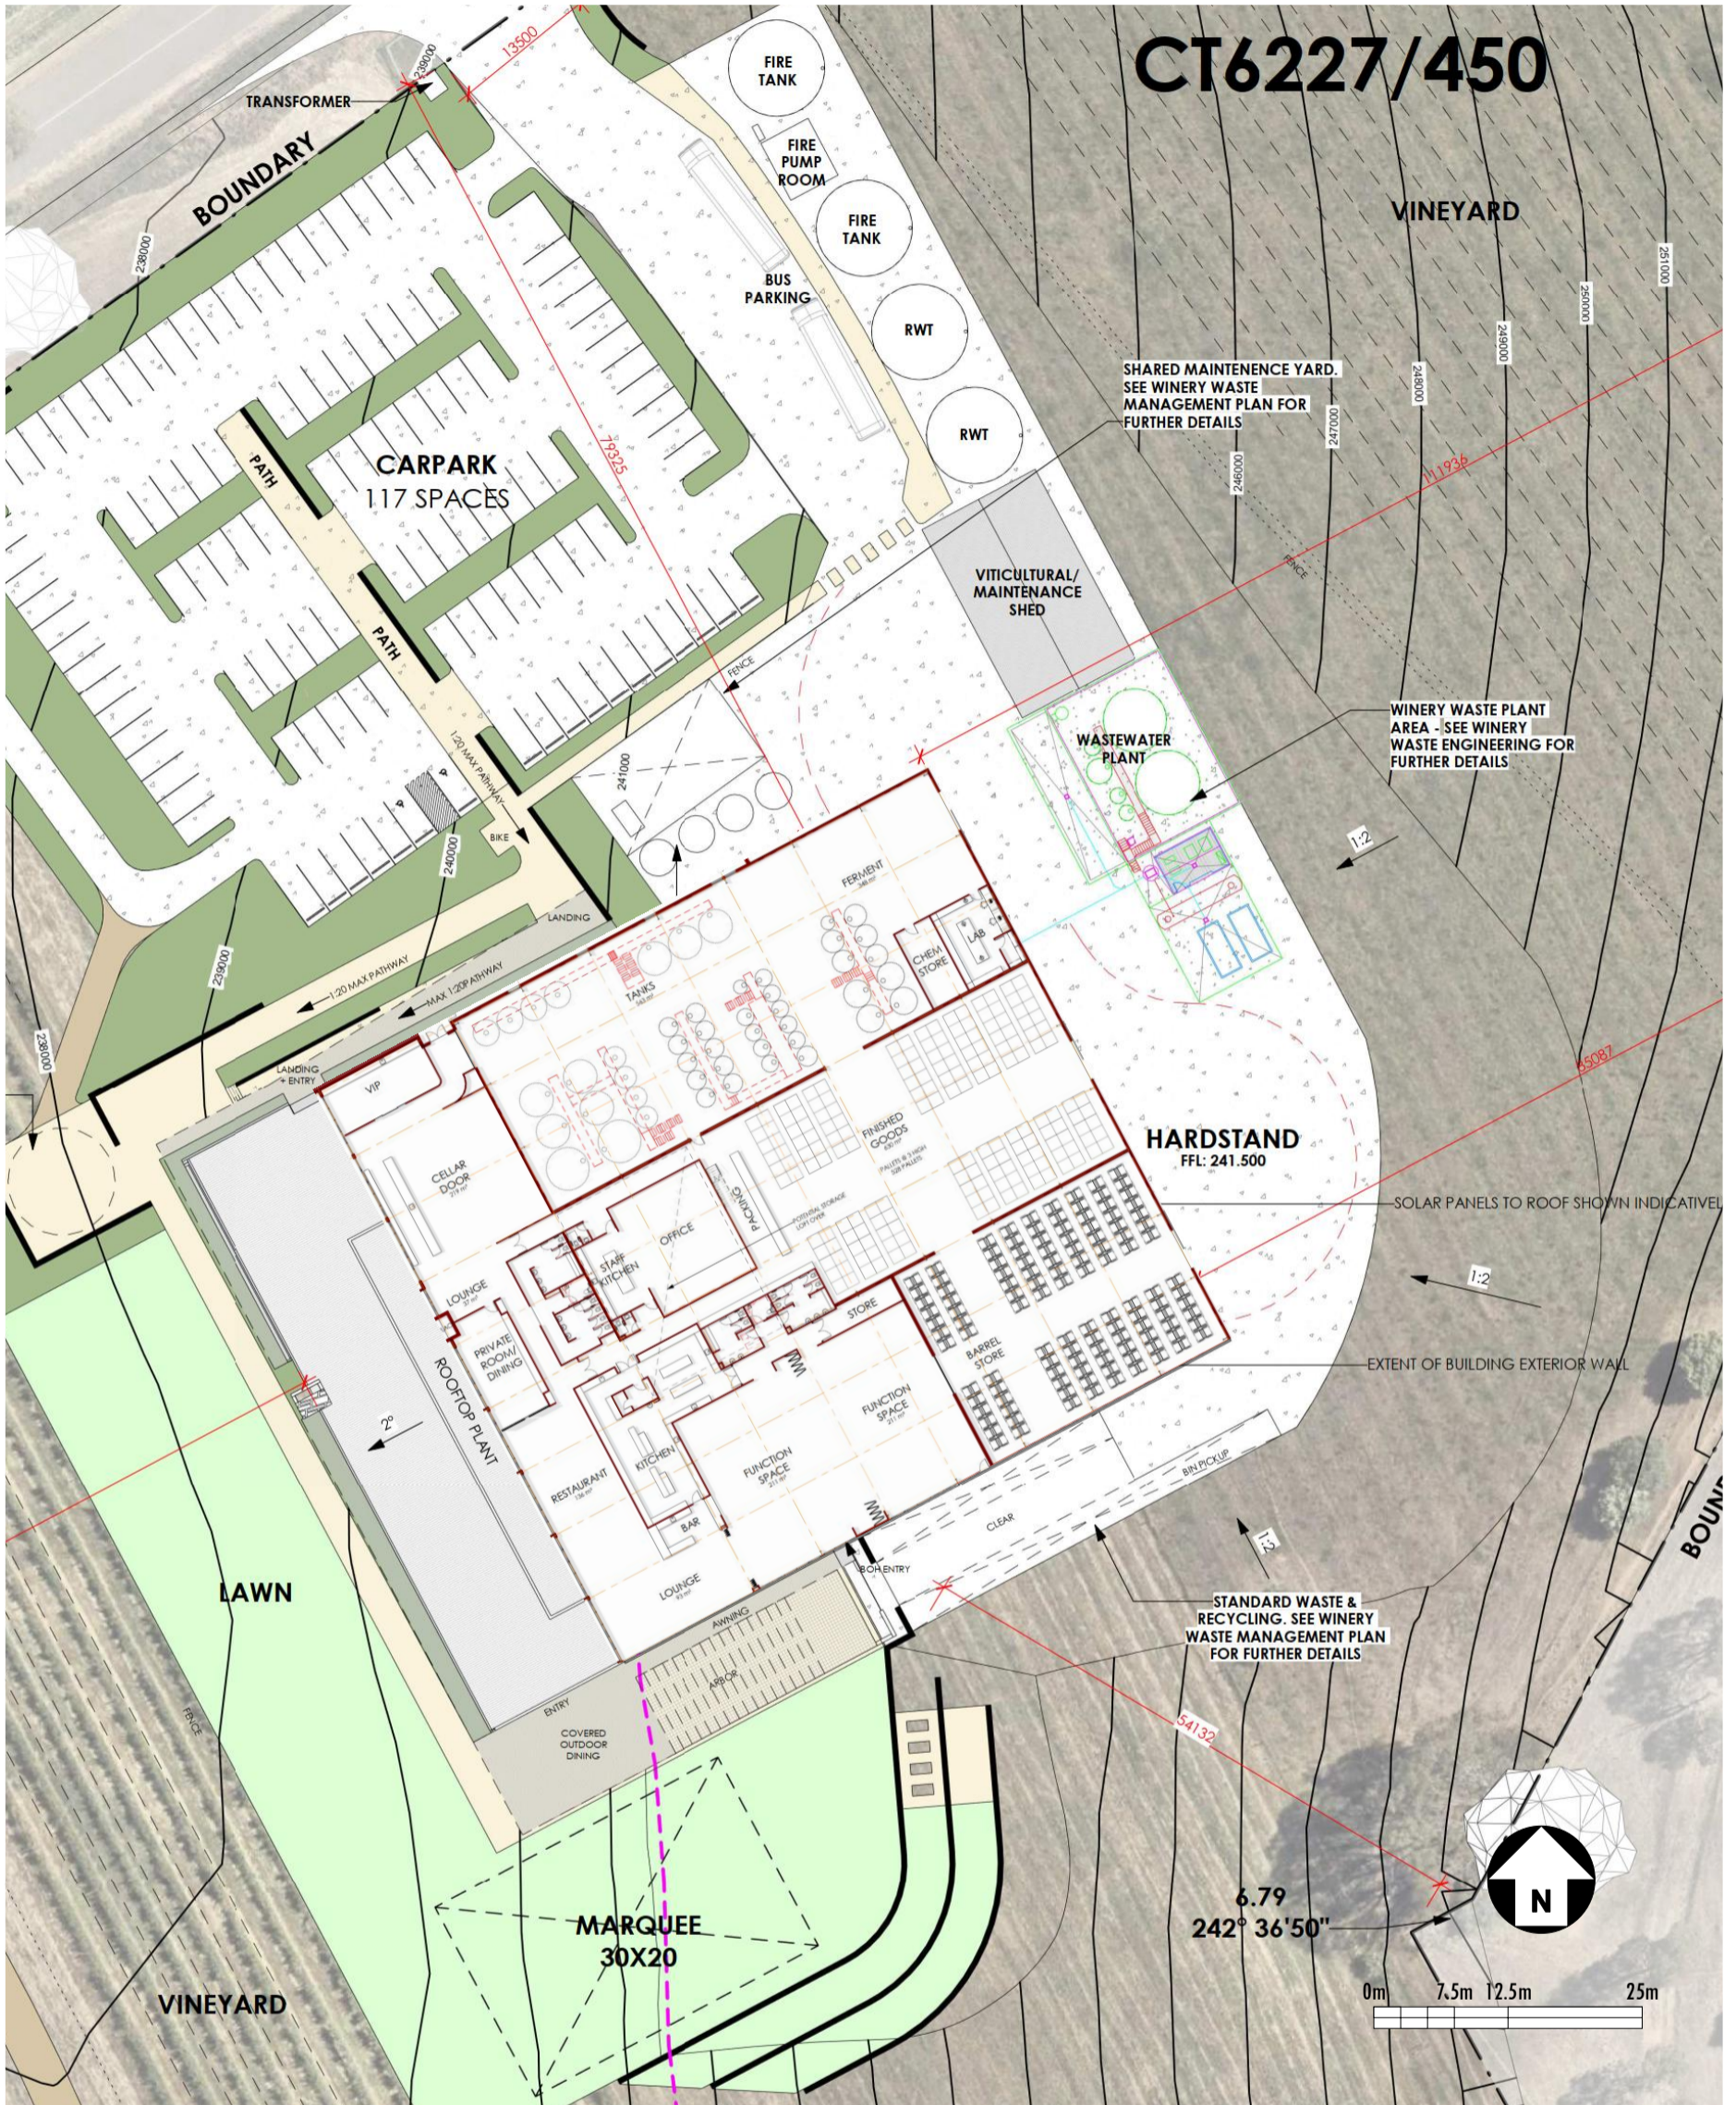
Close-up of the Winery site in Northeastern corner of the winery and vineyard site. Winery site plan reproduced from site concept plans by Project Architect (JBG Architects, 18 July 2025)
